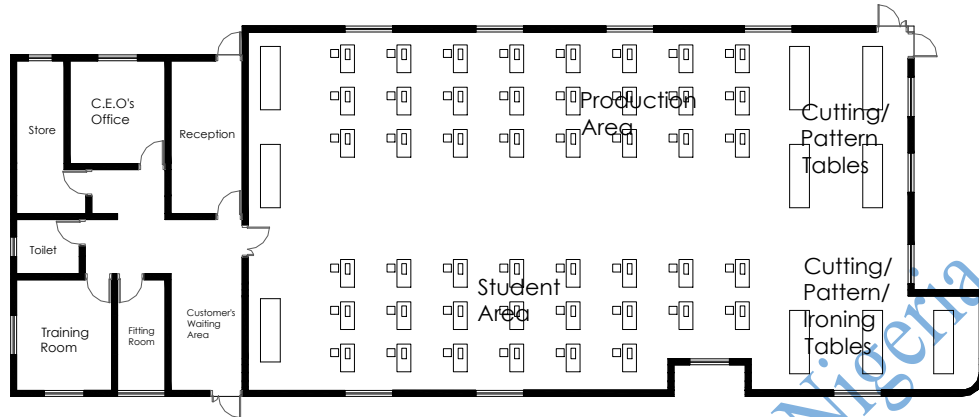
Figure showing the floor plan of Datina Fashion House
